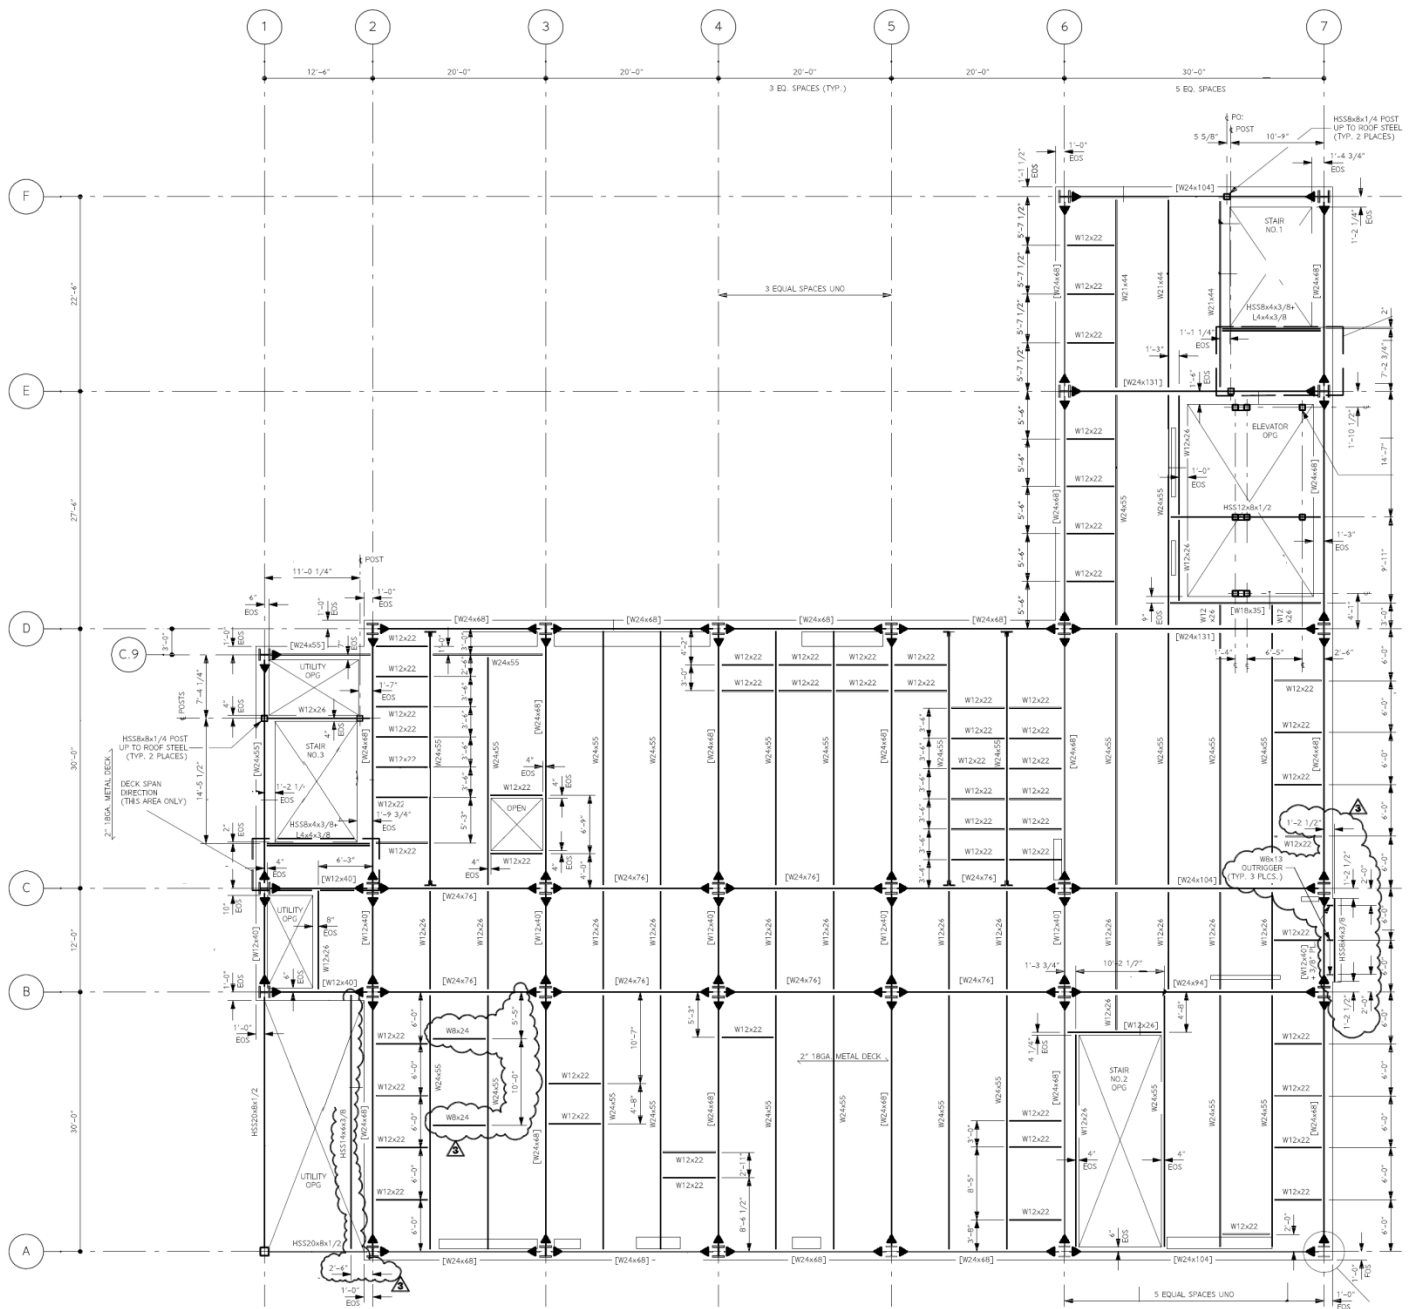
Courtesy of Project Engineer. The fifth floor framing plan.
